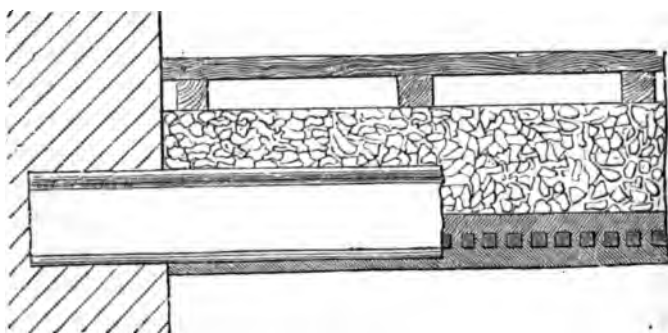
is a section between and in the direction of the joists, with a boarded surface, the iron joist being broken off, to show the construction of the floor.
